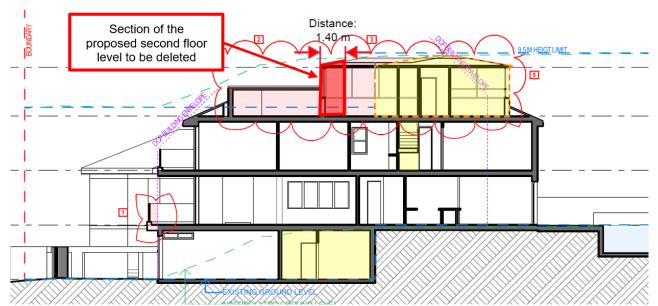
Section showing the area of the proposed second floor level which is recommended to be deleted under Condition C.9(a)
